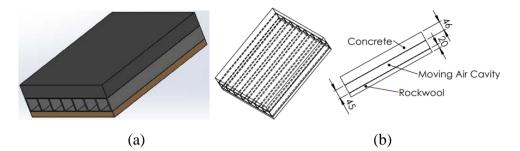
The Moving Air Cavity with Concrete and Rockwool (a) Solidworks (b) 3D Drawing.
